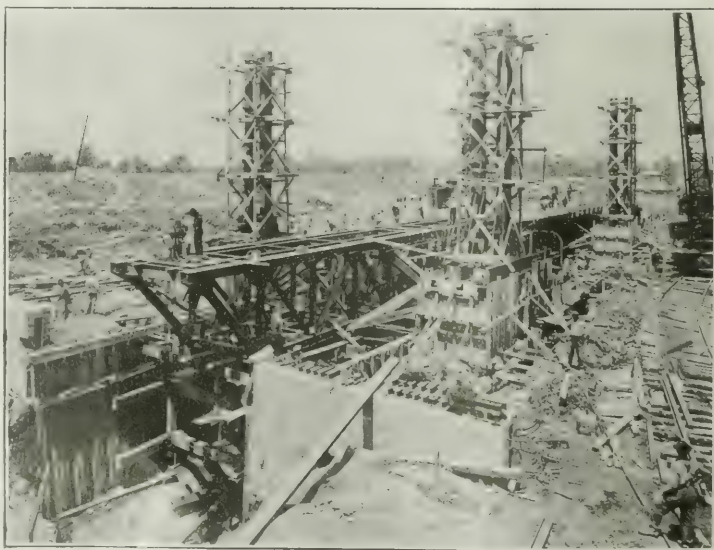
LAUNCHING PLATFORM AND HYDRAULIC JACKS DURING CONSTRUCTION
